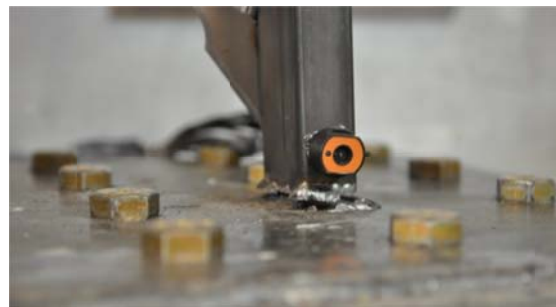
Complete Fracture of Pier 2 EVBE Base Weld
